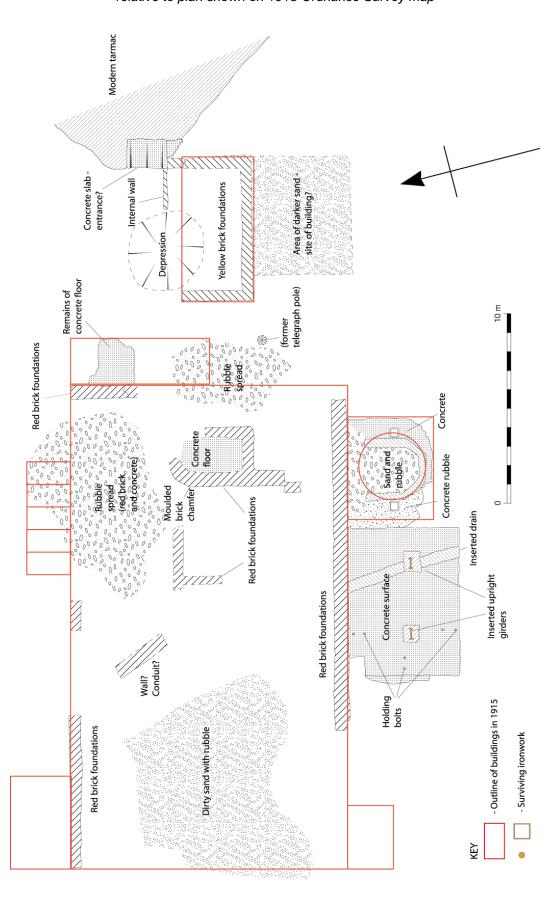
Plan of the Power House foundations, relative to plan shown on 1915 Ordnance Survey map
